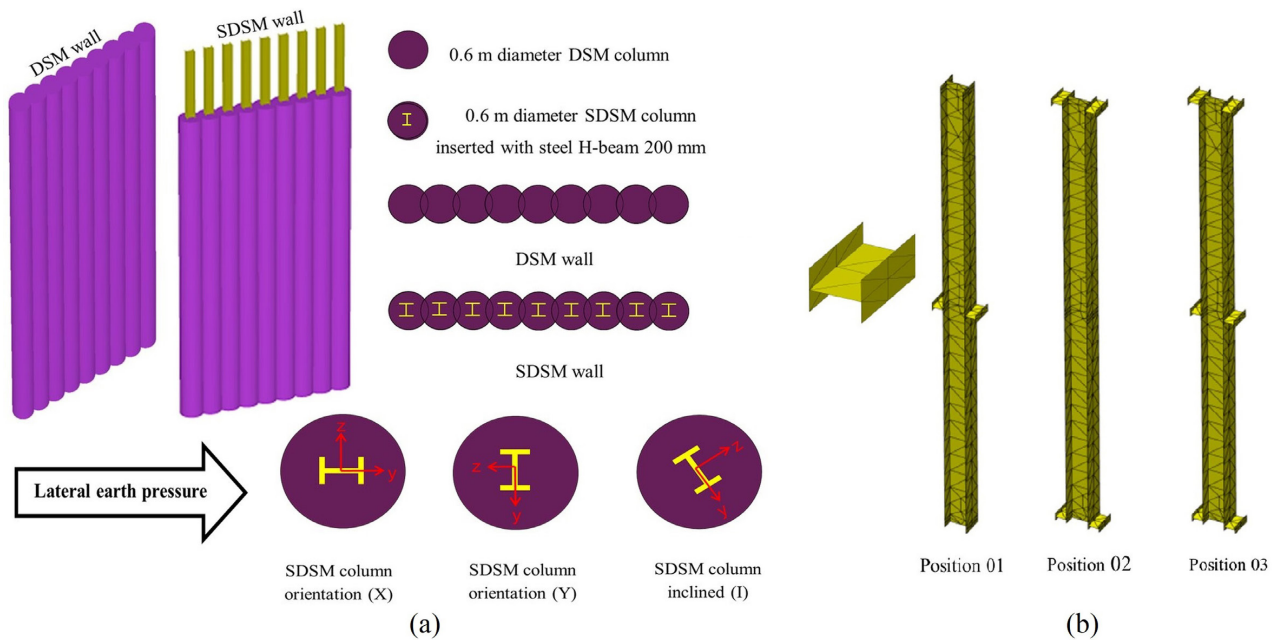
(a) Schematic illustration of the DSM wall and SDSM wall and (b) Schematic illustration of the Steel H-column with connector positions in the structure.
